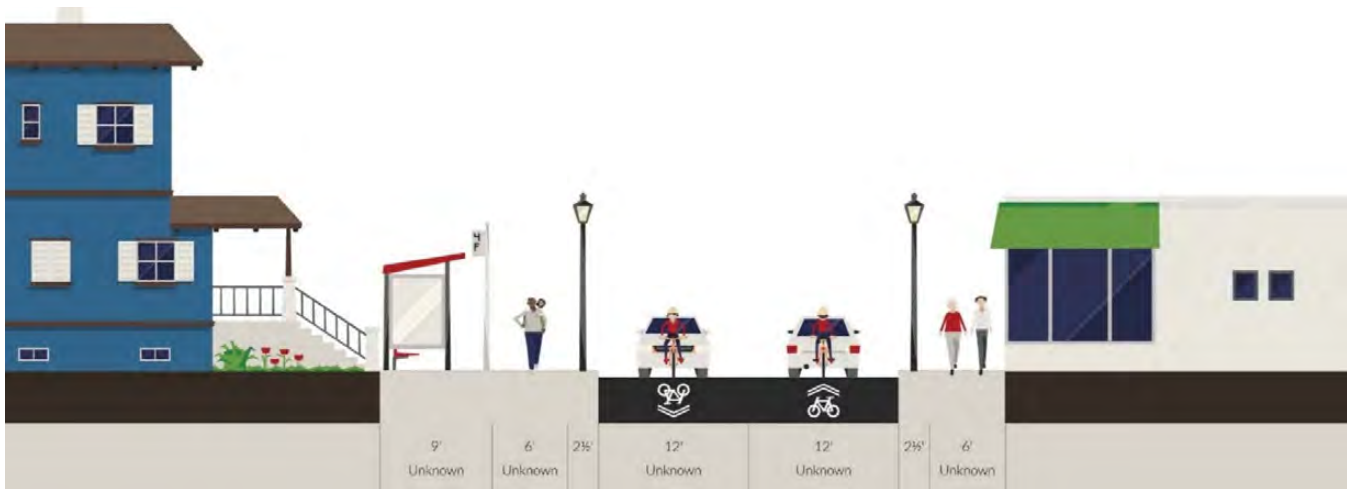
Cross Section: Kerr St. (Downtown Boundary)
